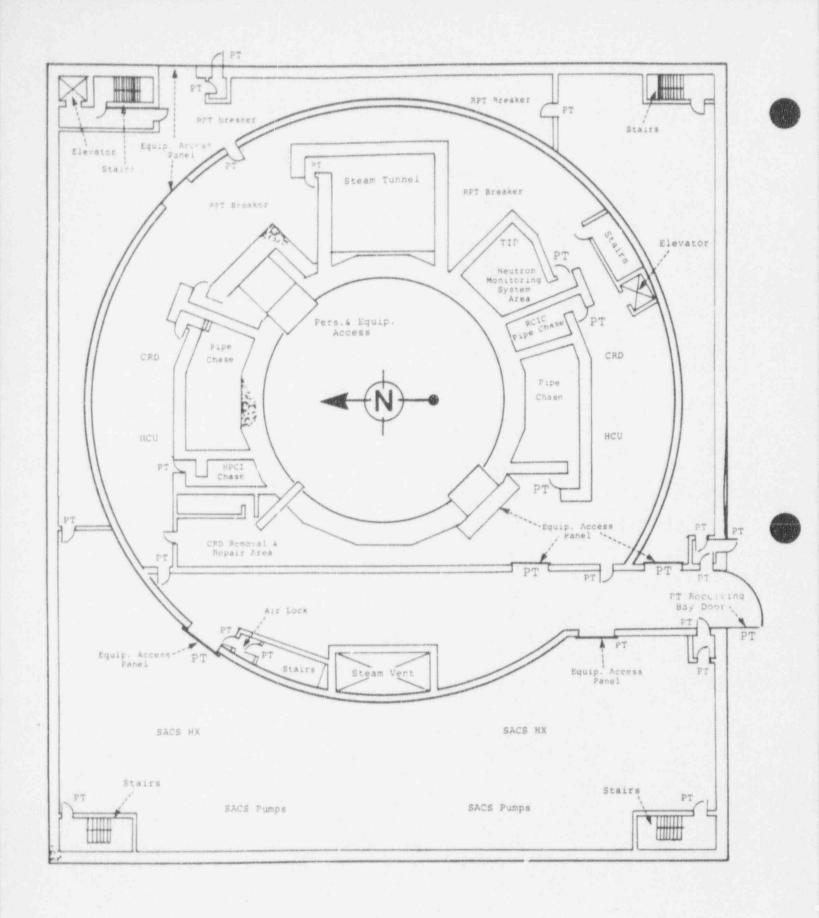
Reactor Building Enclosure Boundary Outline Plan at Elevation 102'-0"
